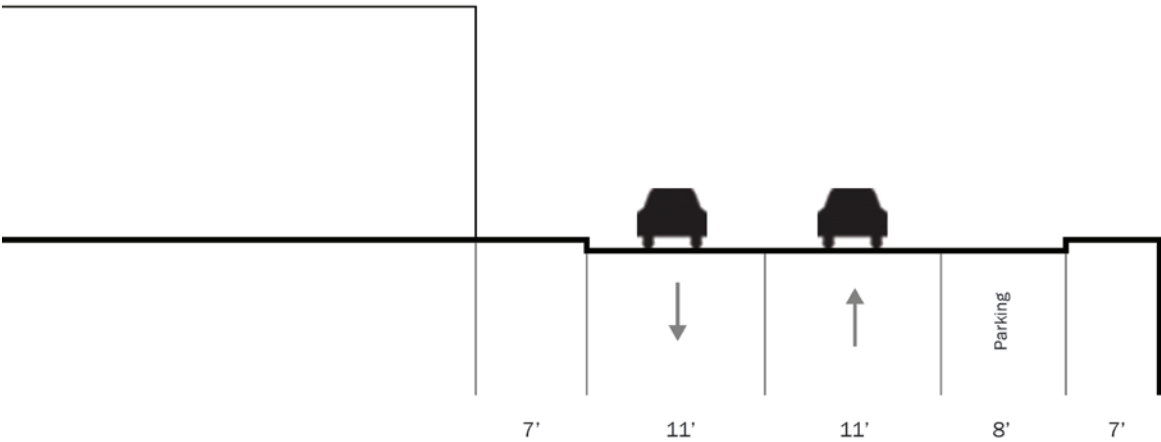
Section of potential Complete Streets lane configurations on Boylston Street from Davis Path to Washington Street.
